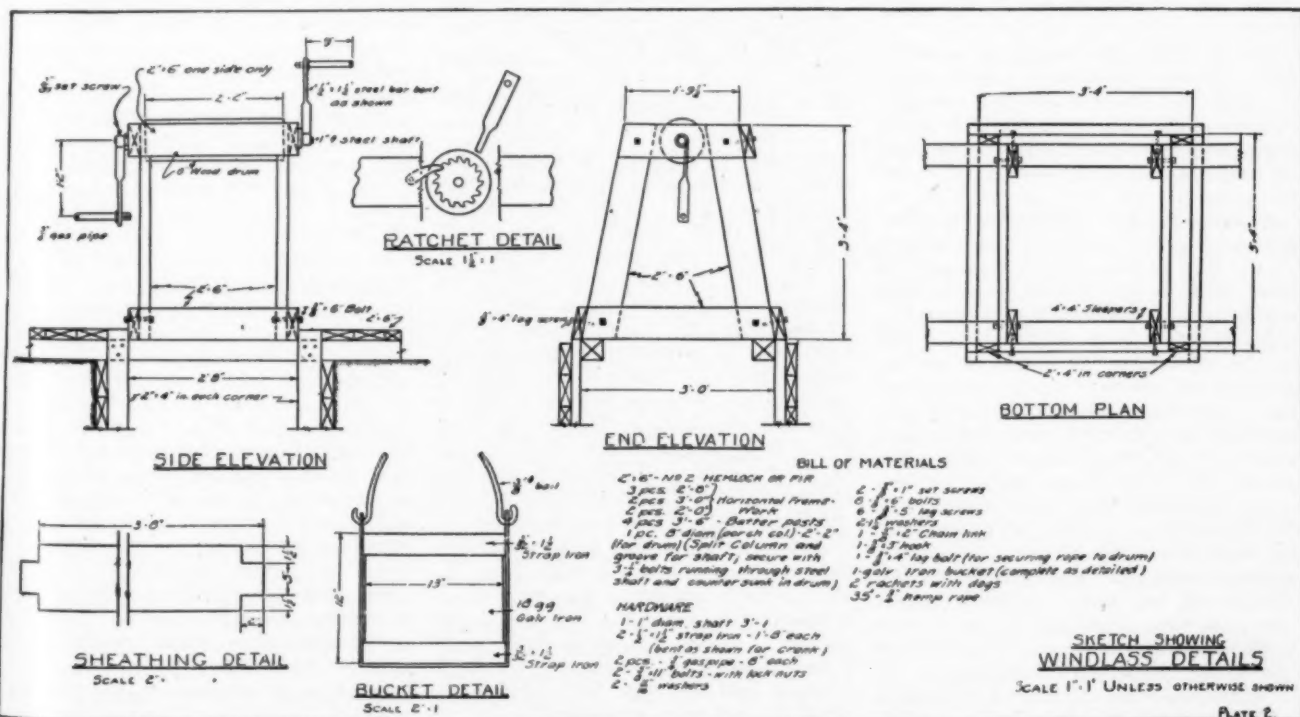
Detailed Drawing of Windlass. A Diagonal Brace May Be Placed at Each End and One Side if Desired. The Bucket Shown Weighs about 16 Lb. The Sheathing Is 22 in. x 6 in. Stock.
